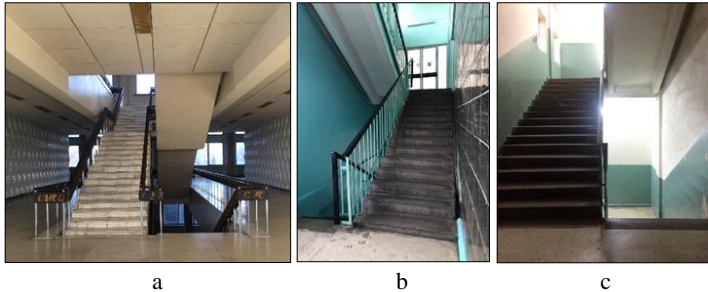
Stairs: a - main, b - transition to administrative-educational building №8 and STL, c - between buildings №8-a and №8-1
